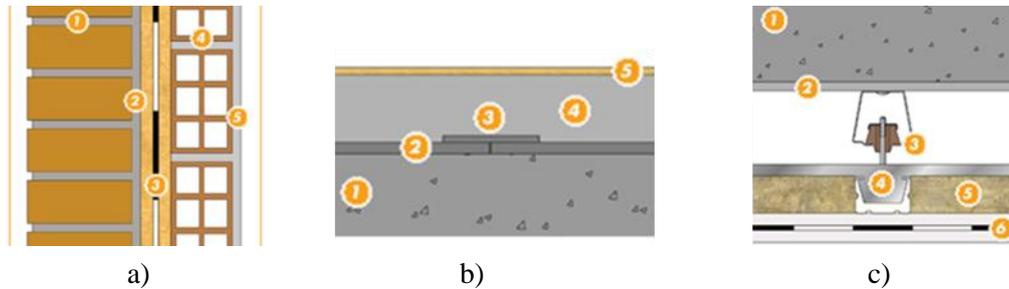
Acoustic insulation a) Designed wall section b) Designed floating floor section c) Designed suspended ceiling section. Source: <http://www.danosa.com/>.
